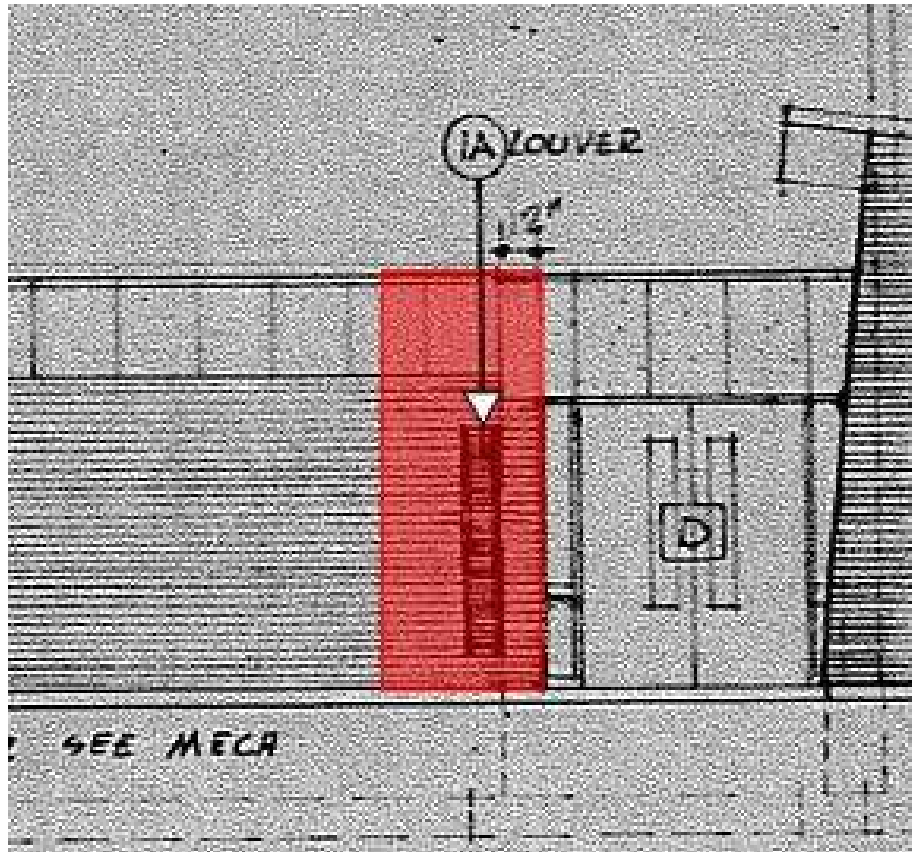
Exterior elevation between Rooms D and E. The approximate area of masonry pier indicated by red shaded area.
